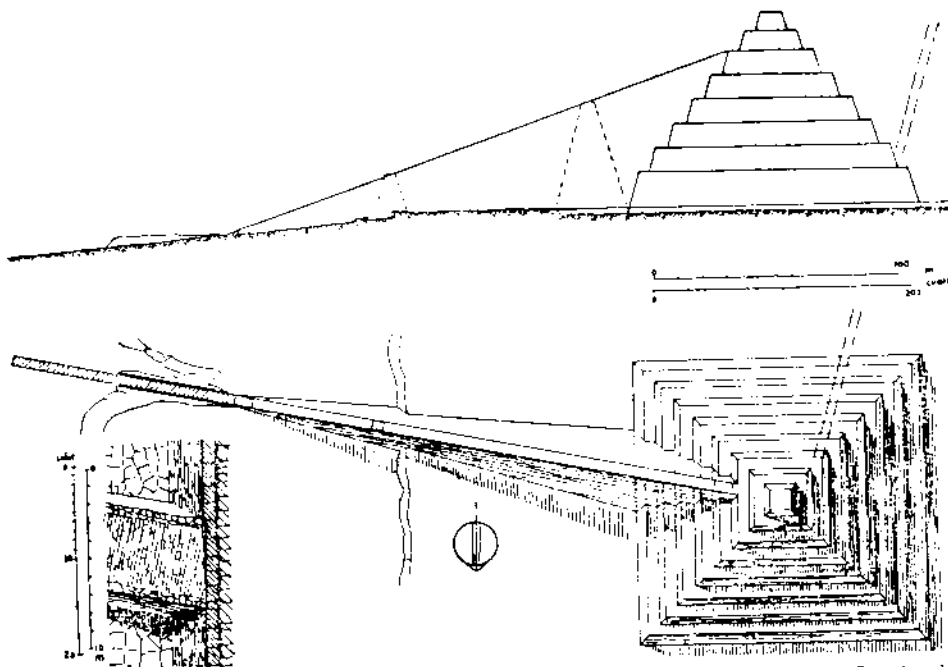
Restored plan and elevation of the ramp at the pyramid of Mejdum (Borchardt).
